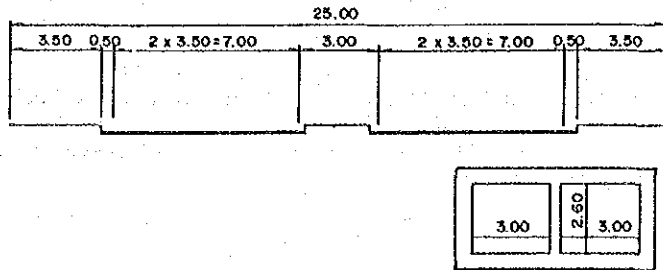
shows the cross section for the case of the channel being open between Eusebio Ayala Av. and Santa Teresa Av.
